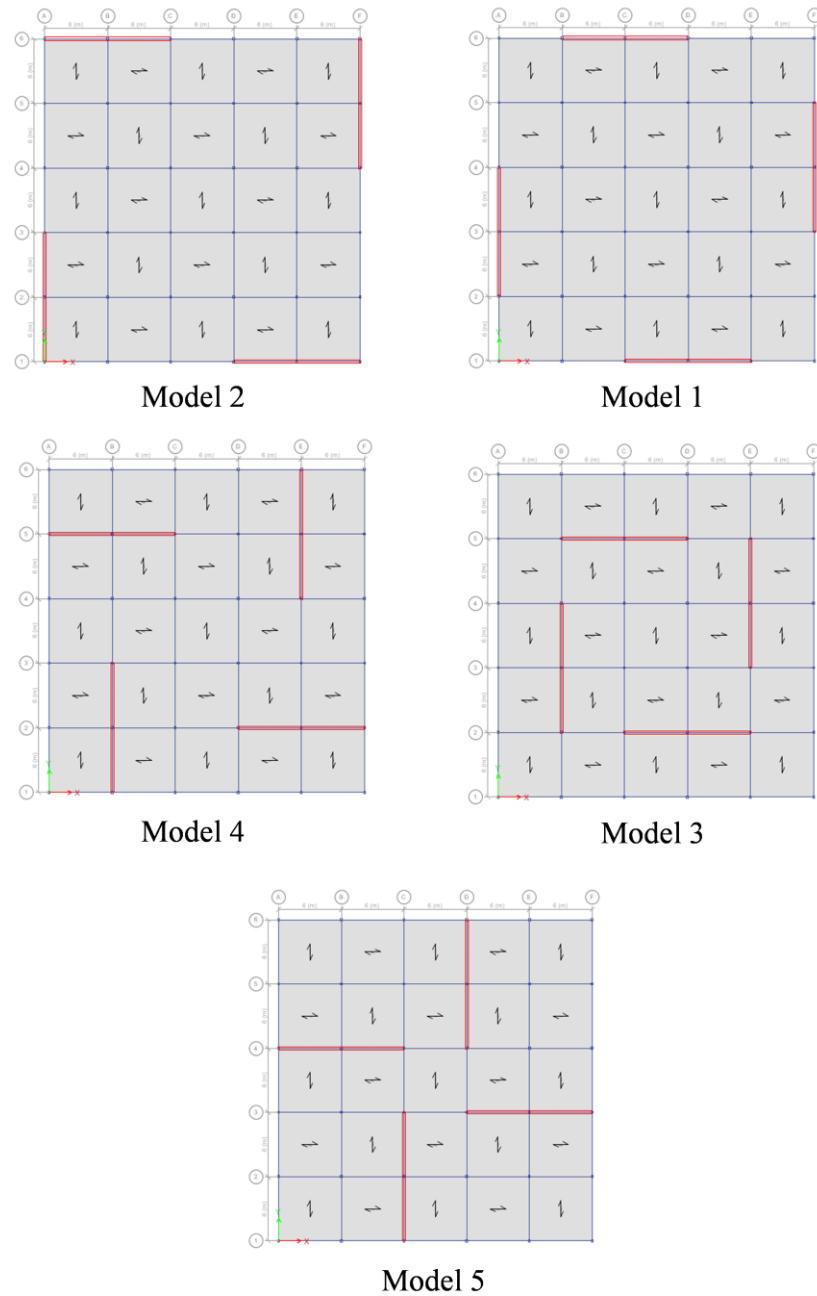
Arrangements of rectangular shear walls in the building plan.
